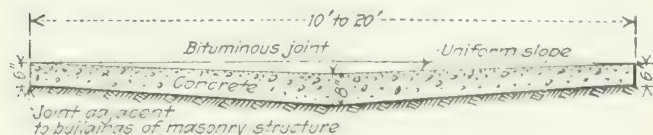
SECTION OF CONCRETE PAVEMENT FOR ALLEYS, MILWAUKEE, WIS.
